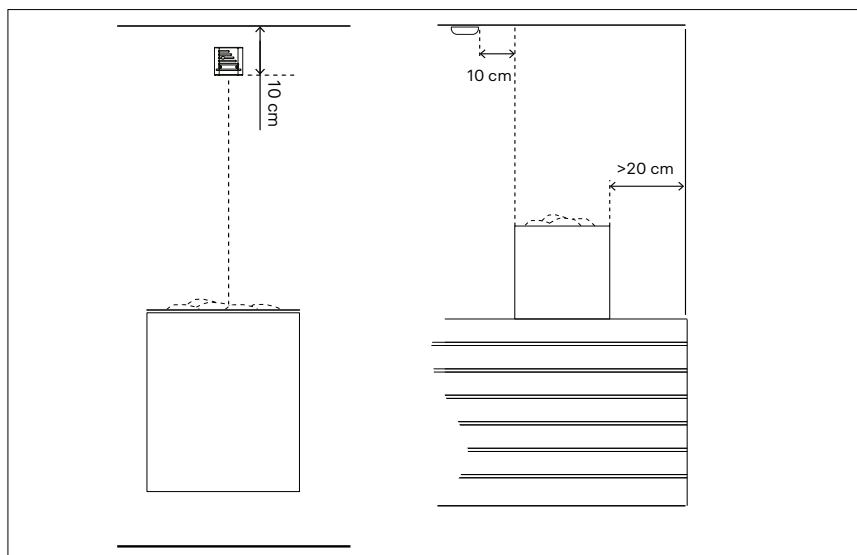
Installation of the temperature sensor on the wall or ceiling
